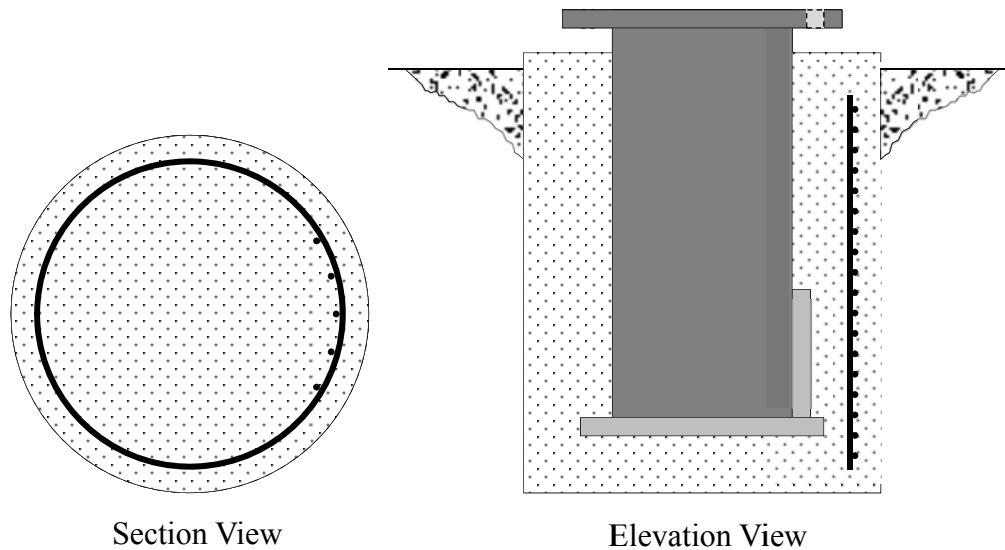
Embedded steel pipe and plate configuration in concrete foundation
